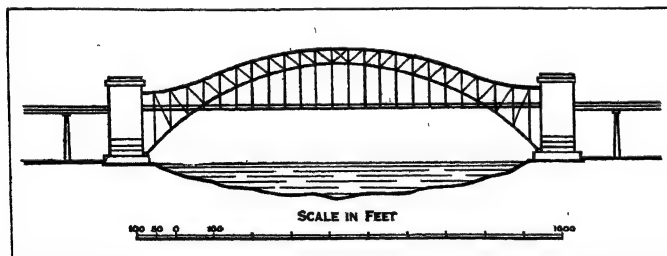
HELL GATE ARCH, HIGH TENSION STEEL BRIDGE, NEW YORK
